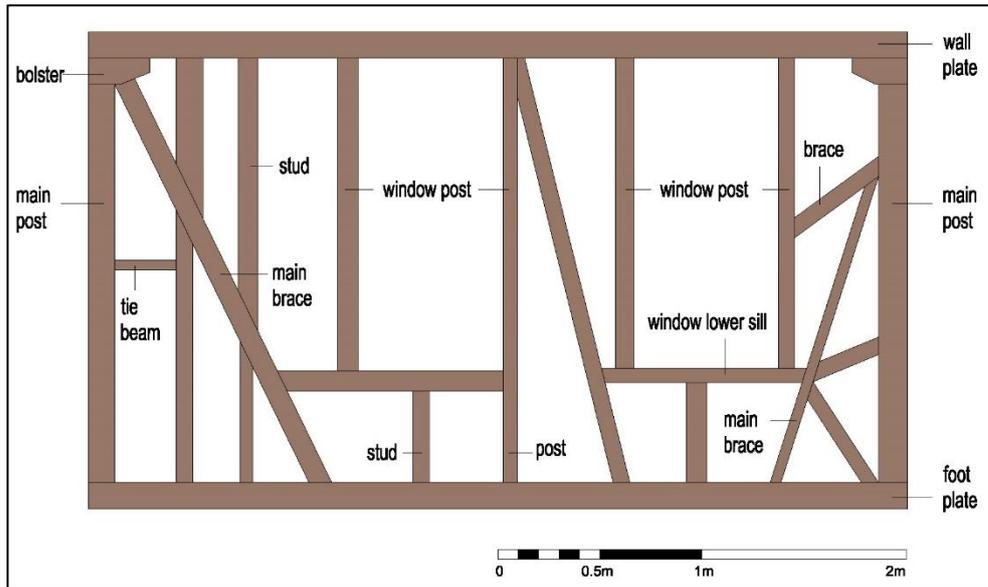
Elevation of a timber frame wall construction (edited from the drawing of dismantled wall of 1st floor of the building: lot no: 2819-1-9 prepared by Sama İnşaat, 2018)
